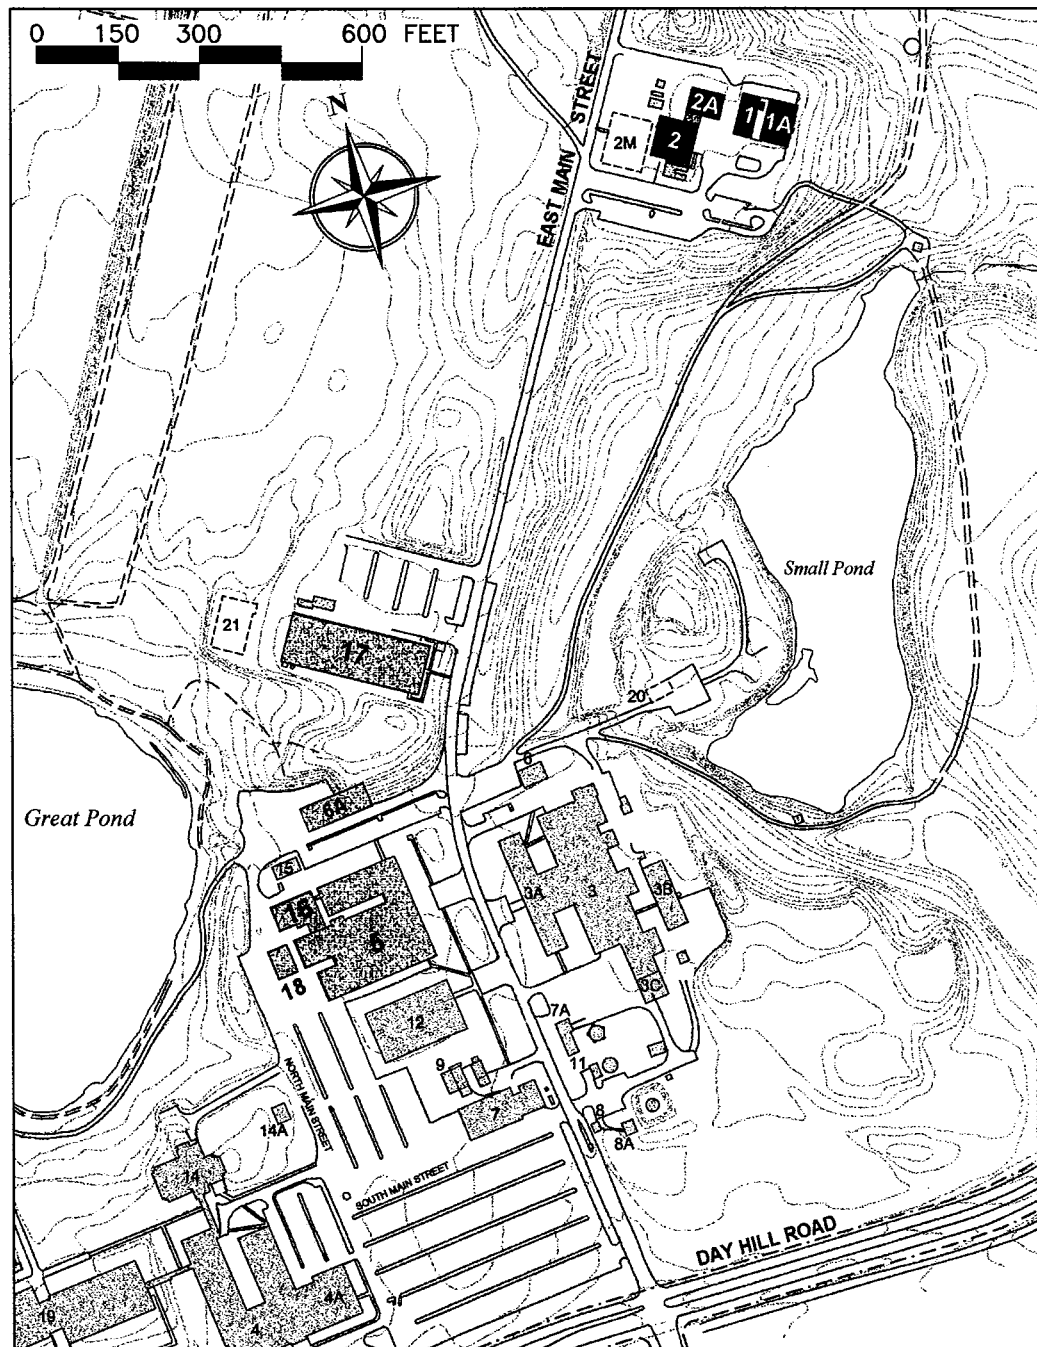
Site Plan of Combustion Engineering Facility - Windsor, Connecticut
